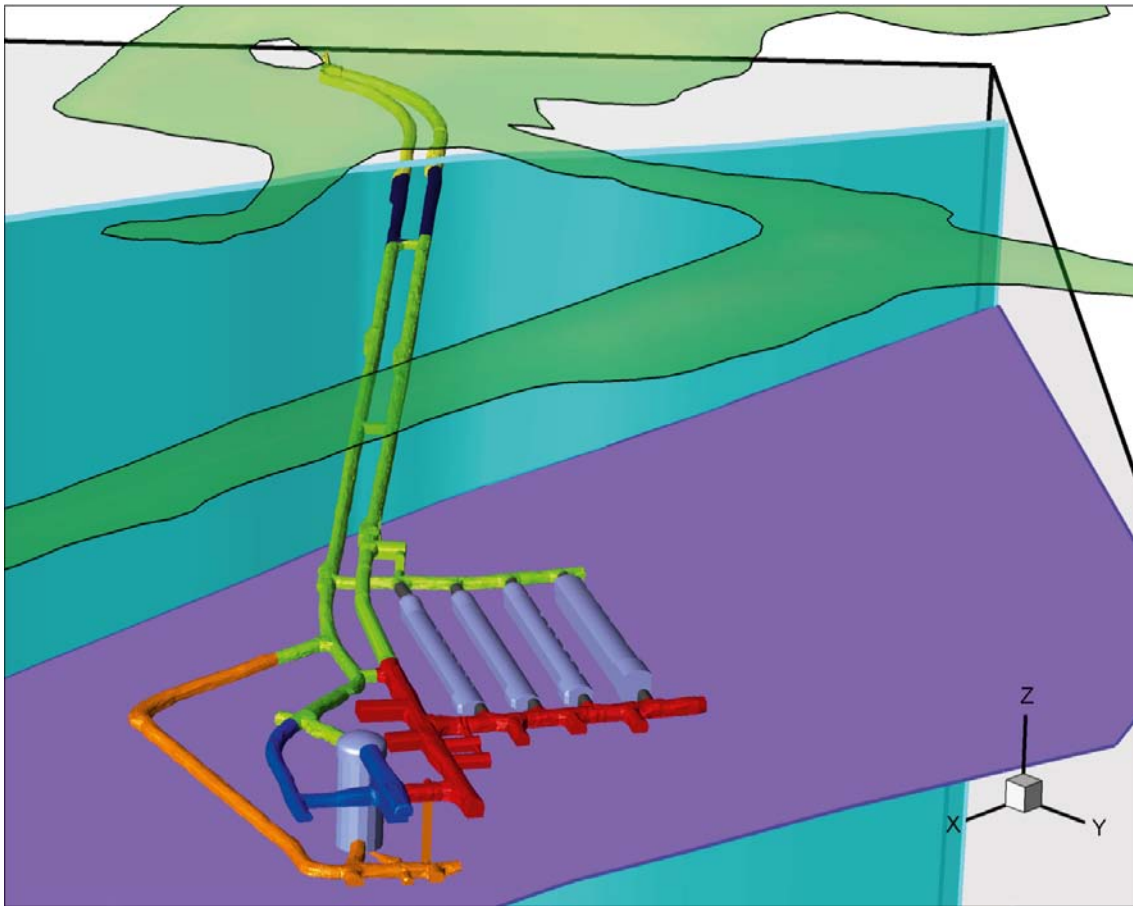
Tunnel objects discretised by areas of tunnel inflow; storage facilities (grey), access tunnels above and below the intersection with Singö deformation (yellow, respectively, green), NBT (orange) and tunnels downstream storage caverns (red) and silo (blue).
